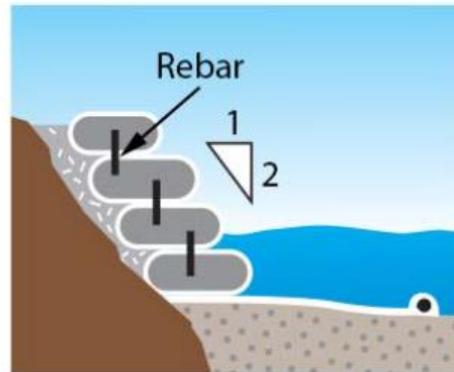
3 Fabric-formed Concrete System for Structural Repairs (<http://www.fabriform1.com/>, 2015)
